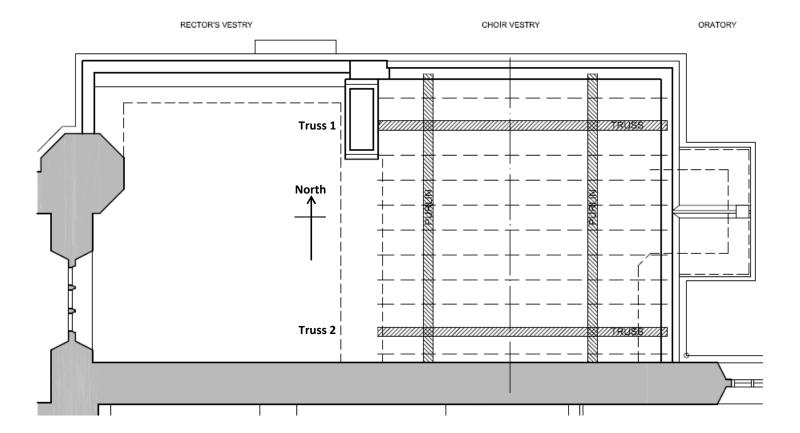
Plan of the Vestry to show layout and arrangement of the timbers (after Lloyd Evans Pritchards)
